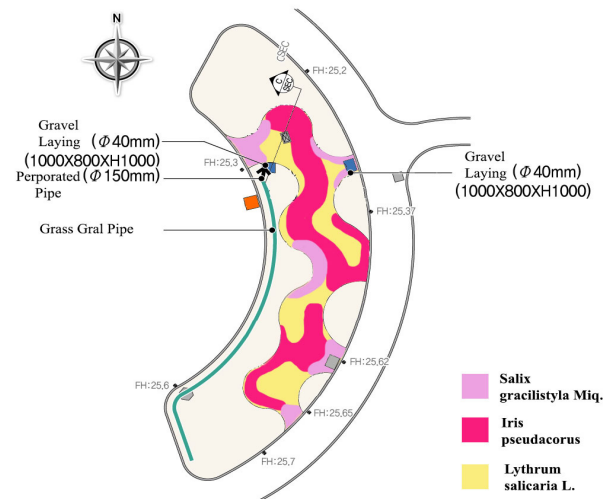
Plantation arrangement in Jeonju Bioretention.
